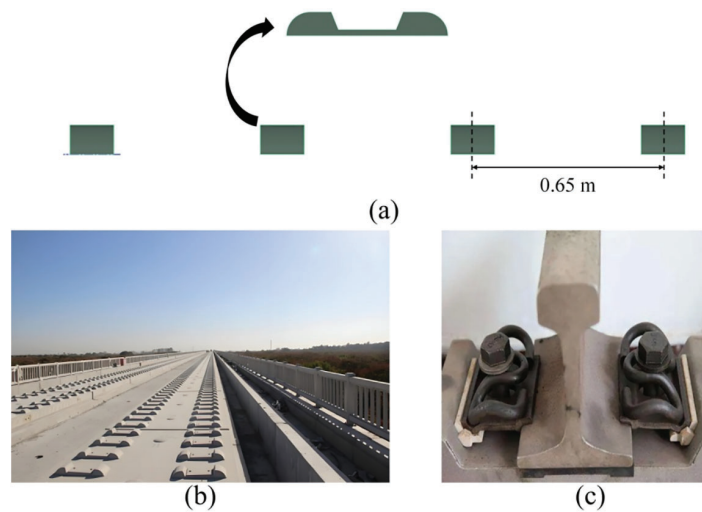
Rail fastening system: (a) positioning distance, (b) fastening system for a railway in Henan Province, China, and (c) connection of rails to fasteners
